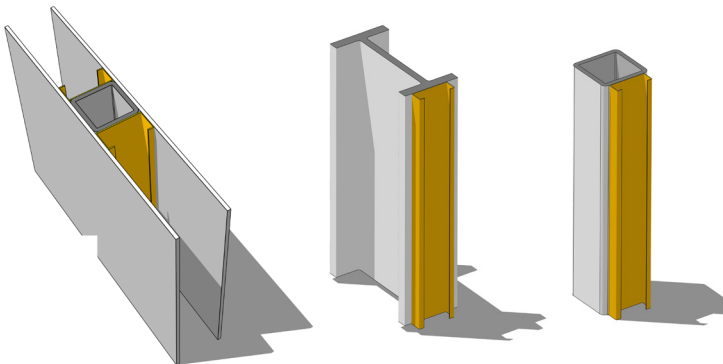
Closed columns/beams examples with coating applied to steel stud channel.
